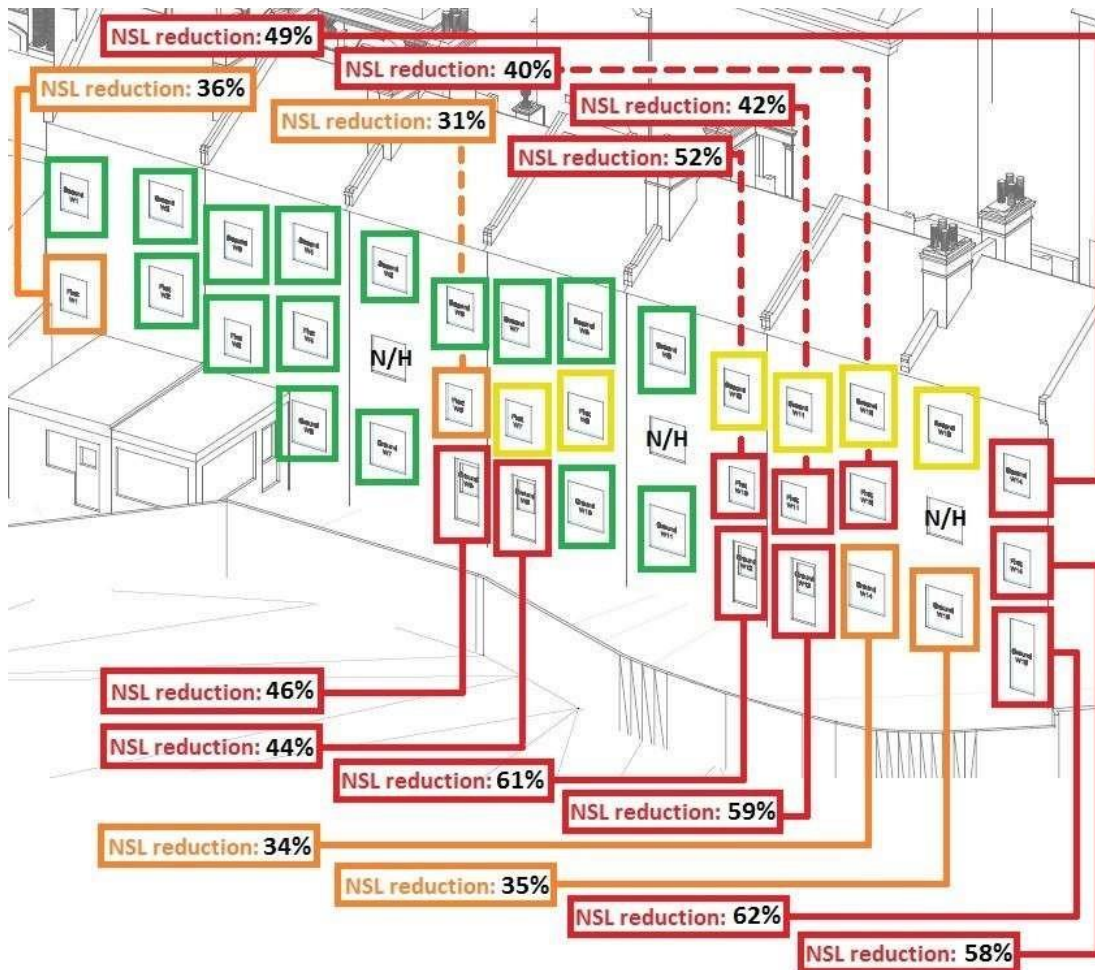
Window map of the southwest elevation of Wren Road Hostel highlighting windows serving rooms that would experience reductions in NSL. The specific NSL losses are given for all rooms impacted to a substantial or moderate adverse extent. N/H denotes windows that serve non-habitable rooms.
